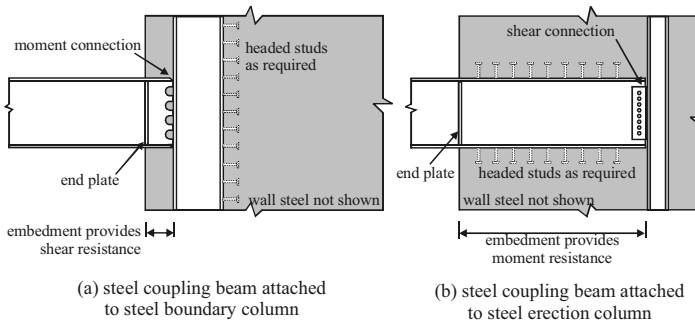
Two types of connections between coupling beams and embedded steel columns.
